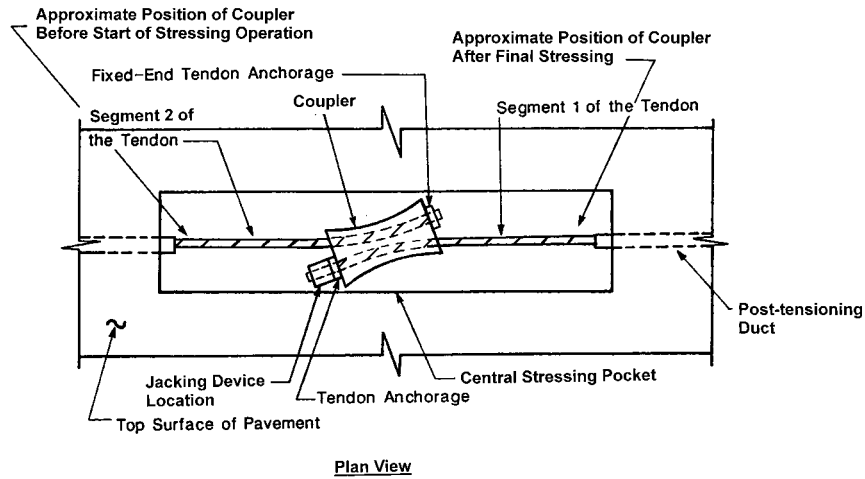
Plan view of a strand coupler used in the central stressing pockets (Ref 6)
